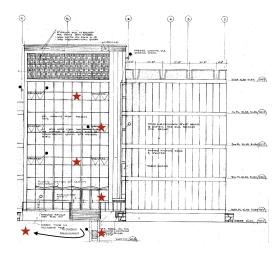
Schematic of the Elliott building used to estimate the floor-by-floor height of the building. A rough position of where in the building each data run was undertaken is highlighted by the red stars.
